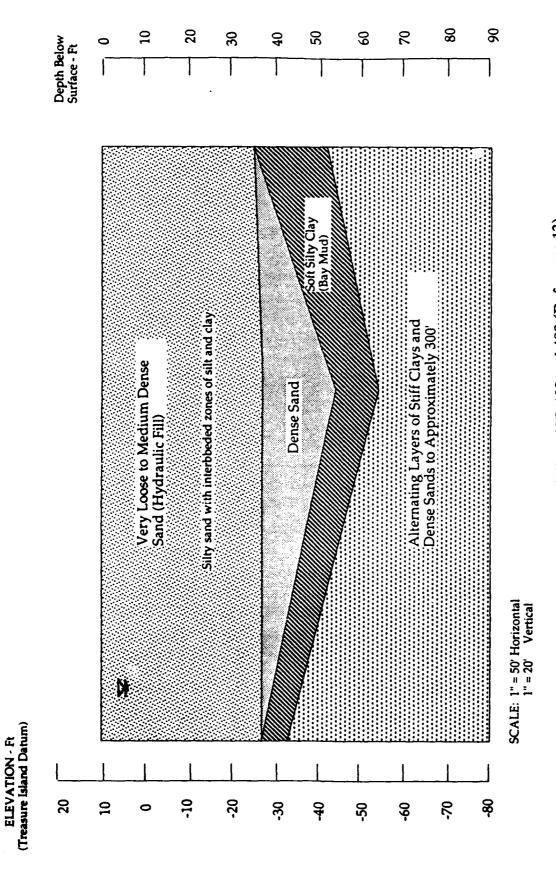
Subsurface profile, Buildings 487, 488 and 489 (Reference 13)
